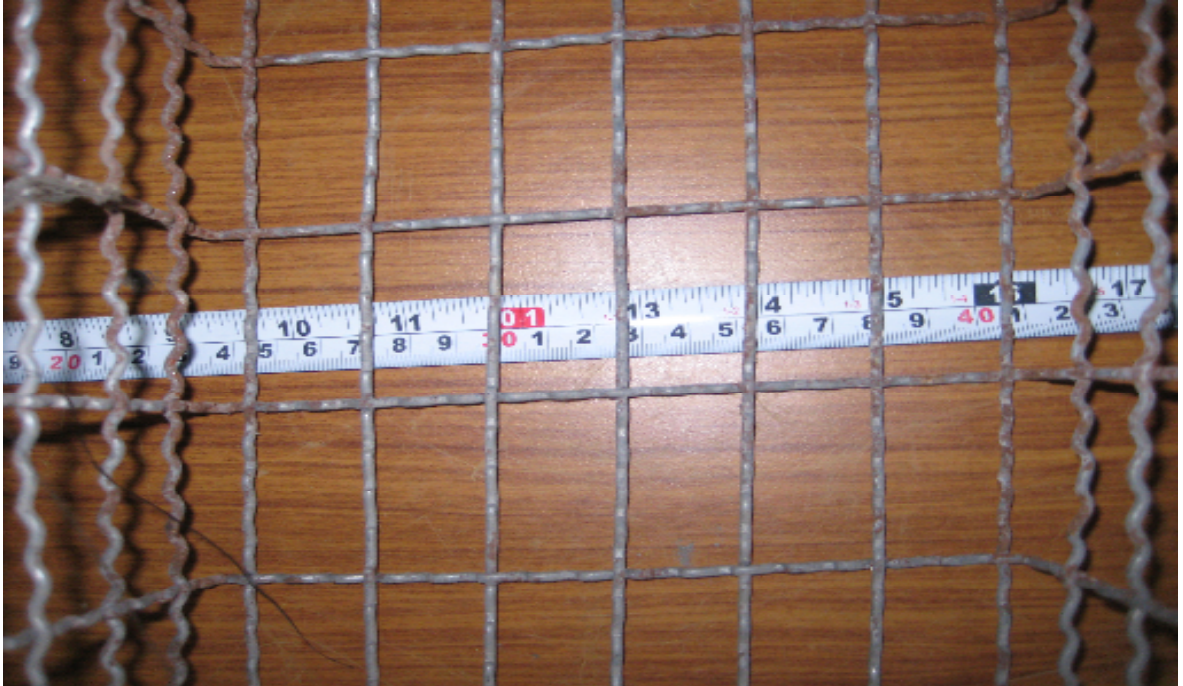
STEEL MESH SHOWING TRANSVERSE DIMENSION
